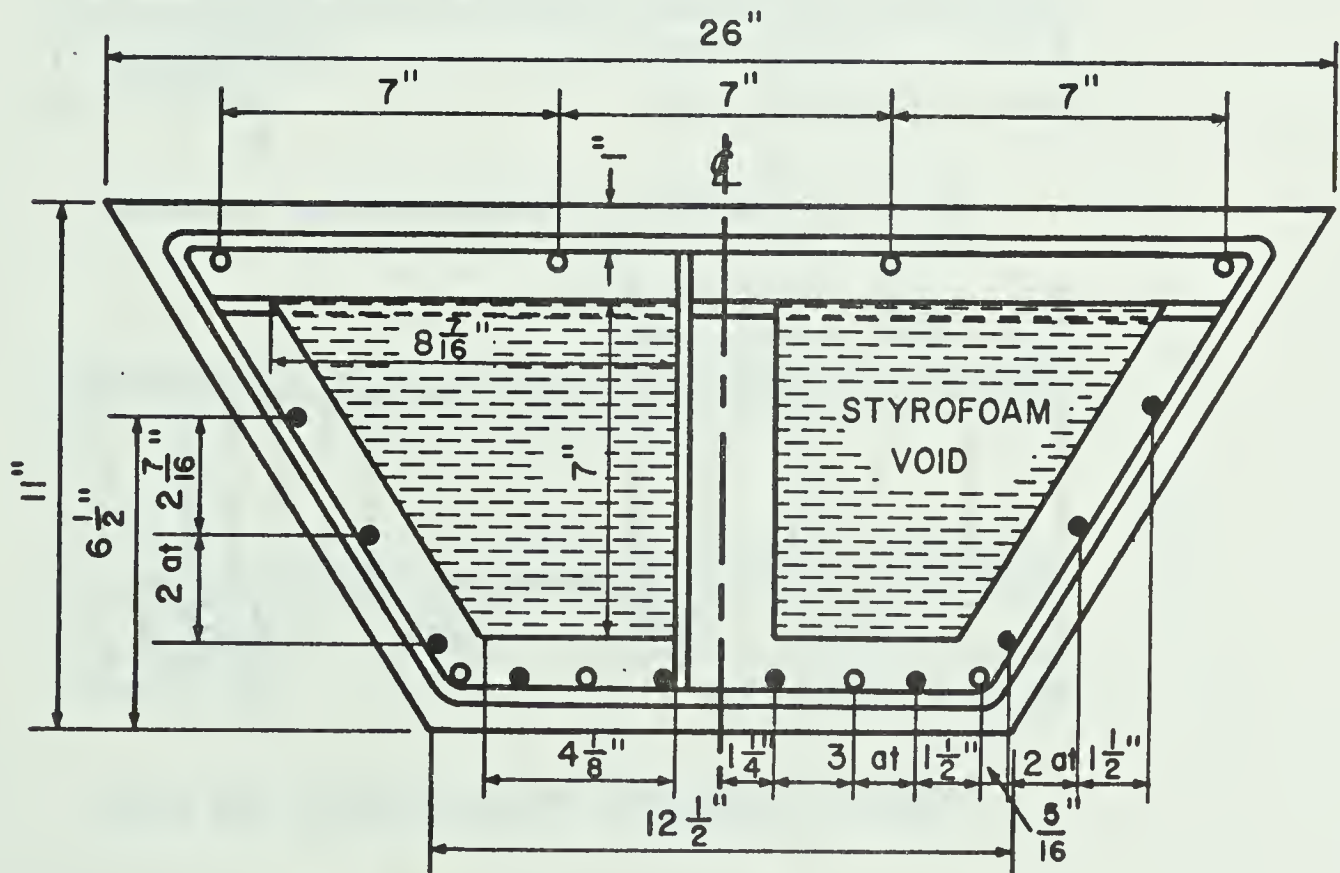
(B) TRAPEZOIDAL BEAM CROSS-SECTION
